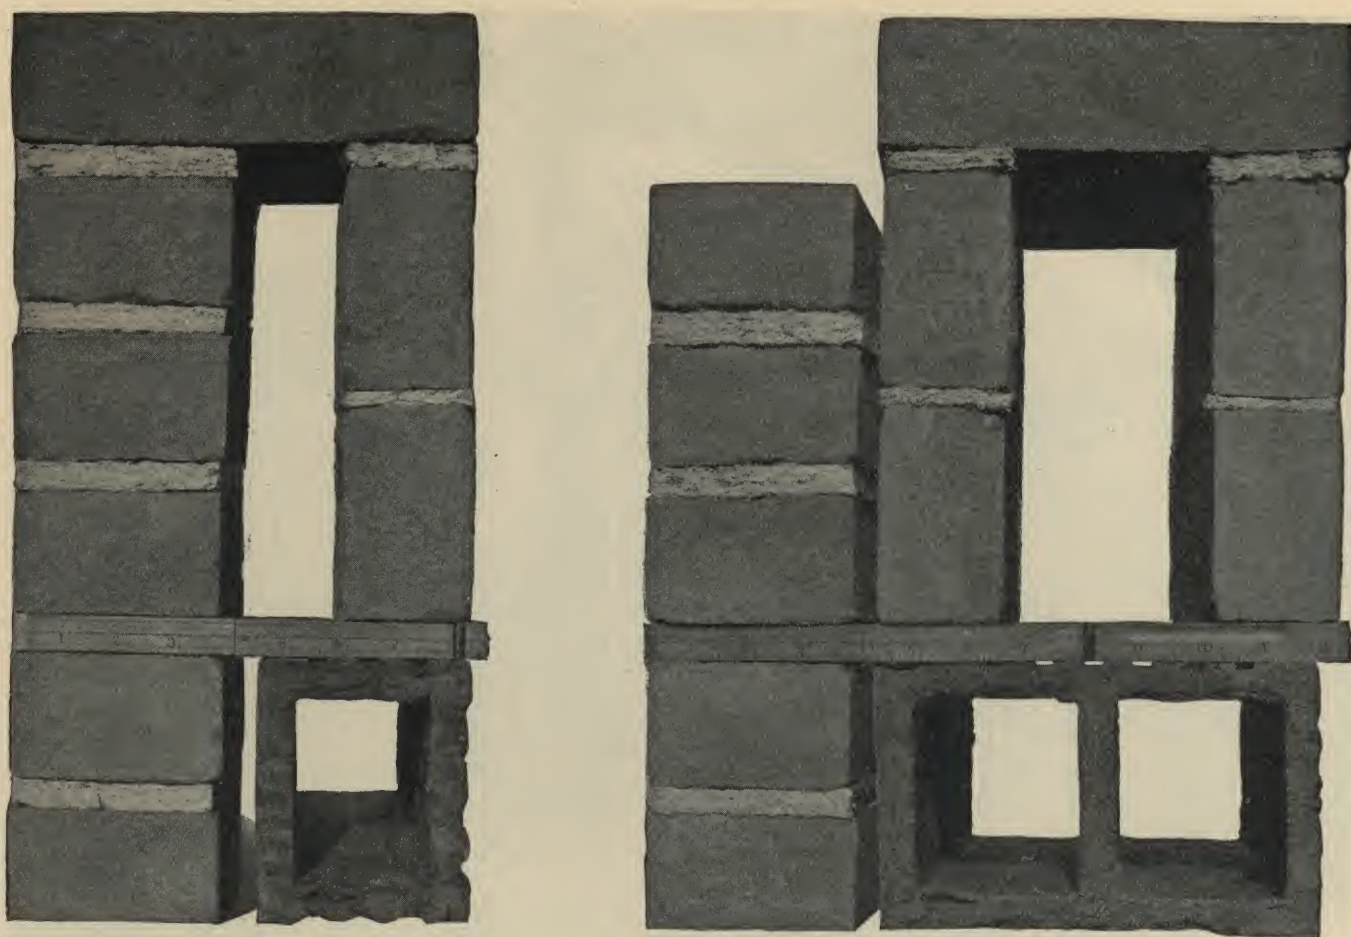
The illustrations show, below the rules, cross section views of 8" and 12" walls constructed with brick facing and typical hollow back-up units; above the rules, 8" and 12" rolok-bak walls. Total net thickness of solid bearing material in the two $\frac{5}{8}$ " shells of the hollow unit on the left— $1\frac{1}{4}$ "; in the three shells in the right hand illustration— $1\frac{1}{8}$ ". Total net thickness of brick on edge wythe forming the backing of the rolok-bak wall, left hand illustration (one wythe) $2\frac{1}{4}$ "; right hand illustration (two wythes) $4\frac{1}{2}$ ". These illustrations are shown for the information of building code officials in cities where hollow unit walls are now permitted, as proof of the sturdiness, stability, and great strength of the Ideal wall and as compelling reasons why the Ideal wall should be permitted under the same codes.
